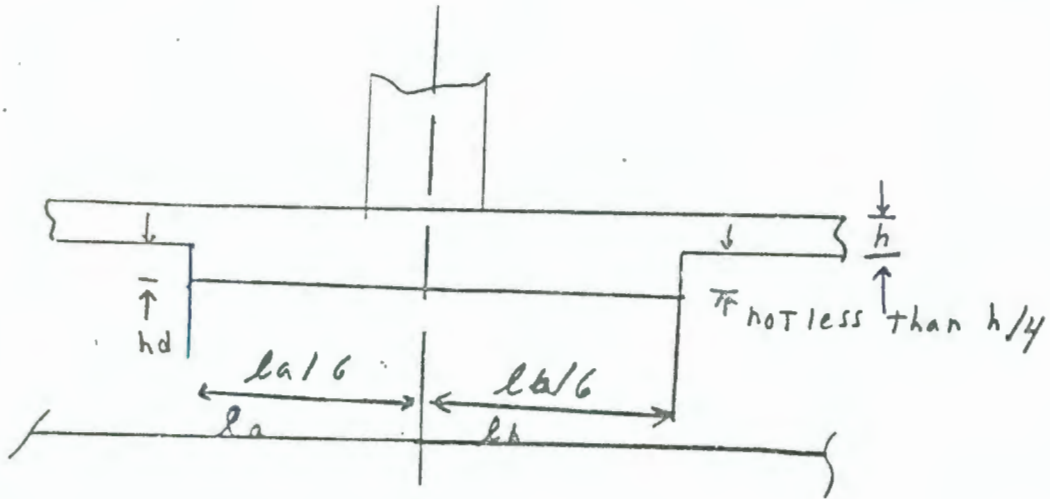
illustrates the minimum design requirements specified by ACI sections 9.5.3.2, and 13.4.7. The drop panels in this building were designed using this method. It was decided that the drop panels would be uniform for all columns, both to save on cost, and for added support. The panels were designed for the worst case columns, which are the interior columns.
